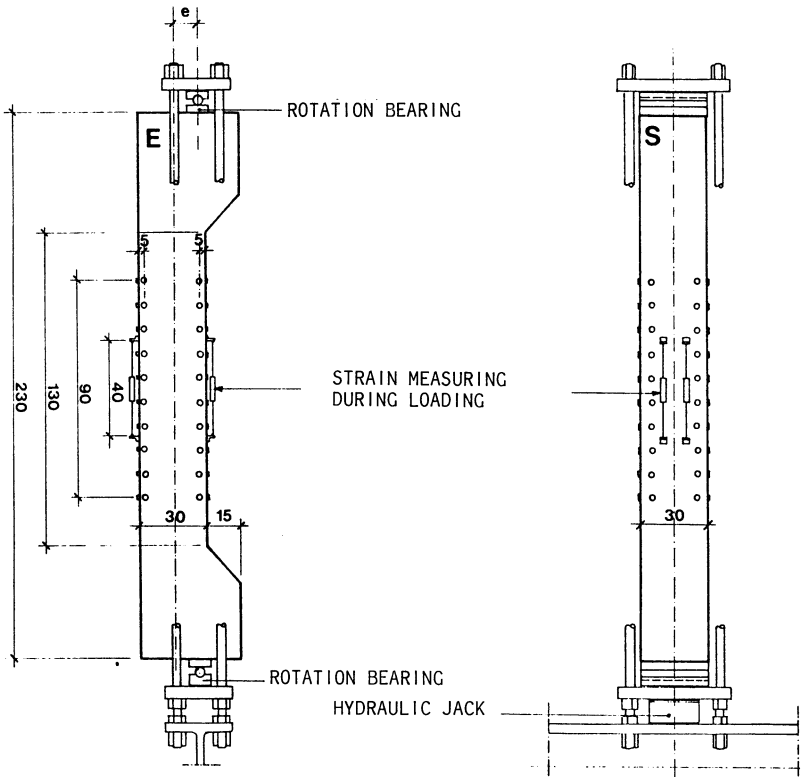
Test arrangement, measuring points and concrete columns dimensions
